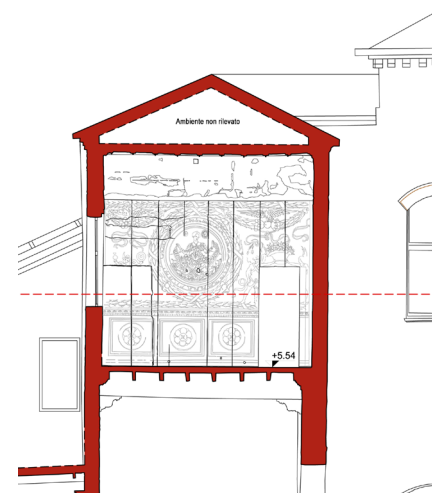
Studiolo's vertical section, on the first floor: drawing in scale 1:20 for describing forms, wooden wall with Africa's allegory. Graphic elaboration by S. Costantini.
